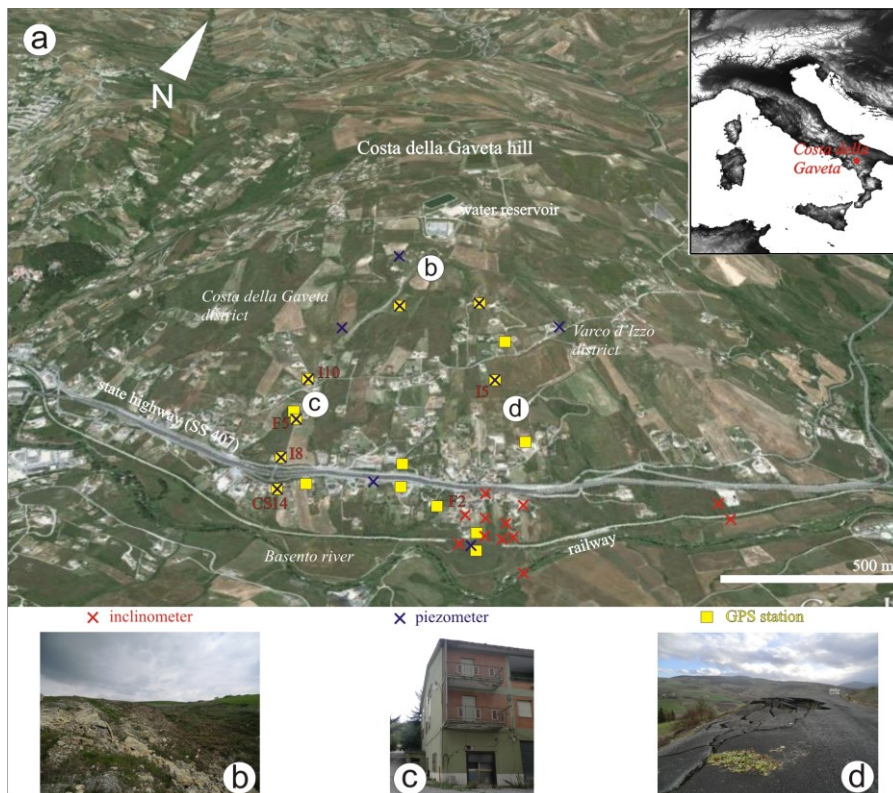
3D sketch of Costa della Gaveta hill, with location of inclinometers, piezometers and GPS stations (a). A landslide's crown area (b); fracture in a concrete wall(c); a damaged pavement road (d).
